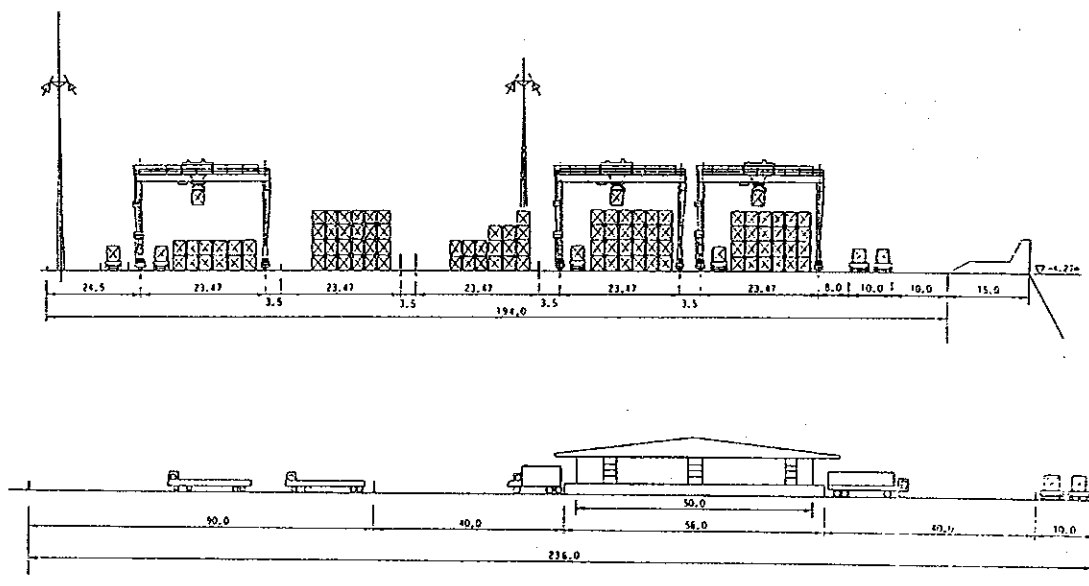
A Cross Section of Shutaify Bay Yard (Unit: m)
